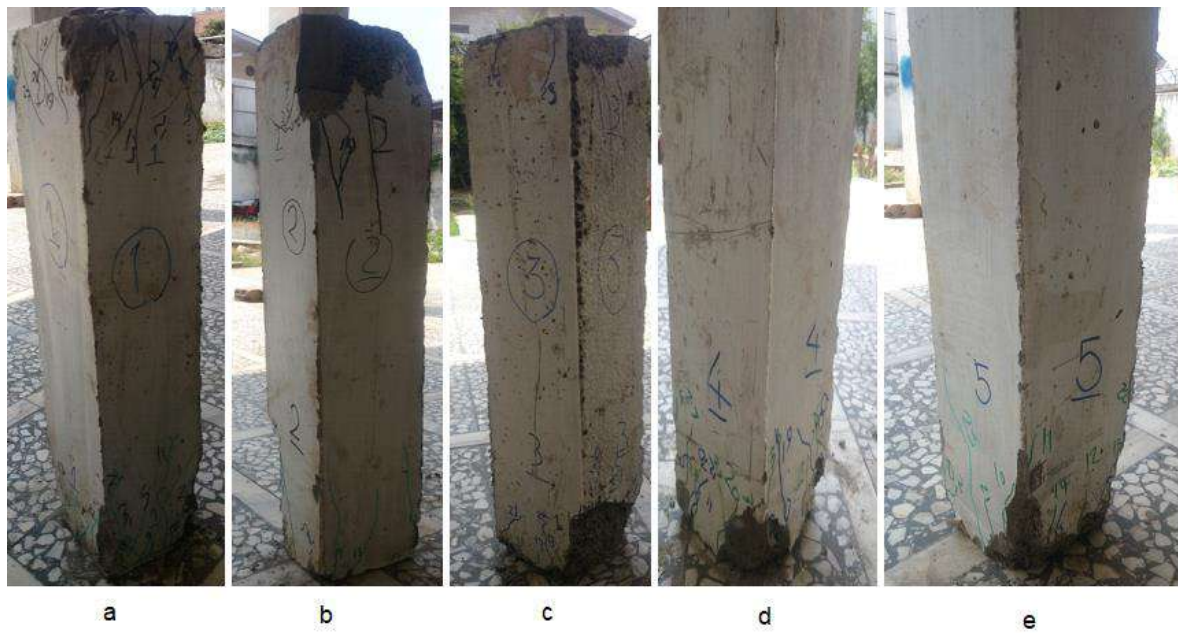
Showing the shape of the cracks after loading the right stones a) column 1 b) column 2 c) column 3 d) column 4 e) column 5
